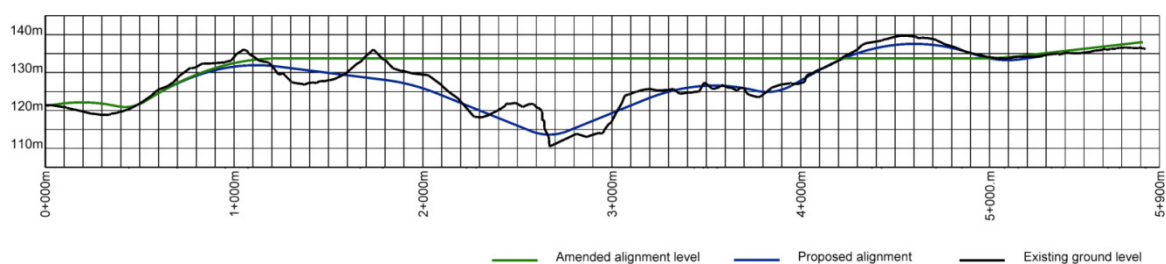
Long section of proposed and amended B4 vertical alignment
